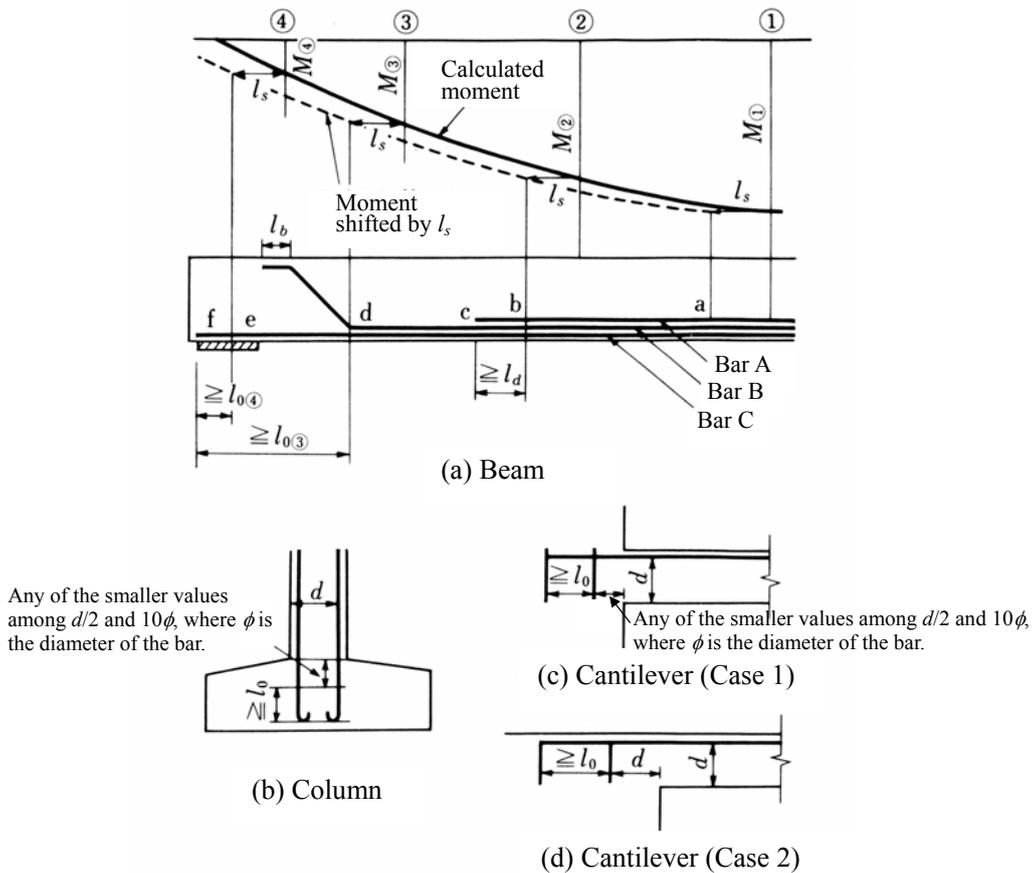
gives examples of critical sections for extension of reinforcement. Bars "A", "B", and "C" in Fig. C5.4 (a) respectively are illustrative the examples for the following cases:
